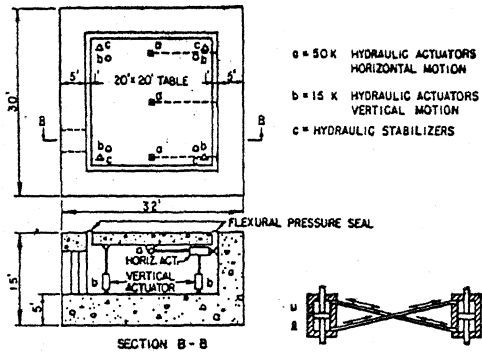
PLAN AND SECTION OF MEDIUM SIZE SHAKING TABLE AND FOUNDATION
